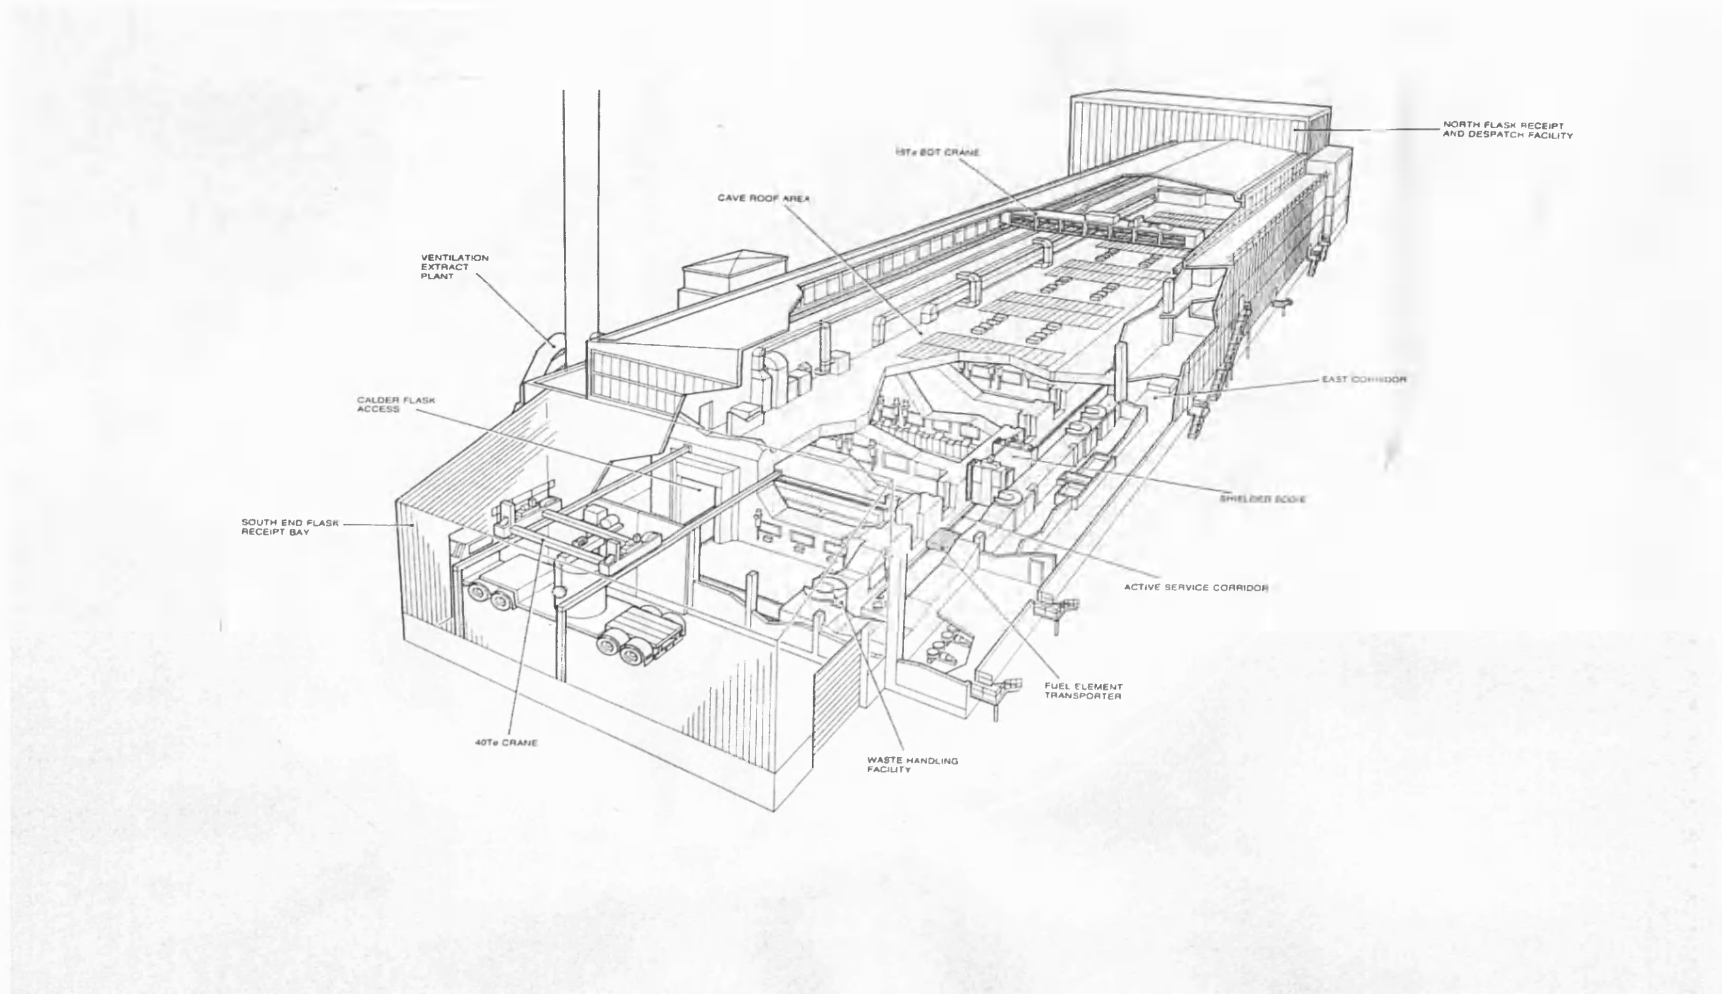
PLAN VIEW OF CAVE FACILITIES (provided courtesy of AEA Technology plc)
